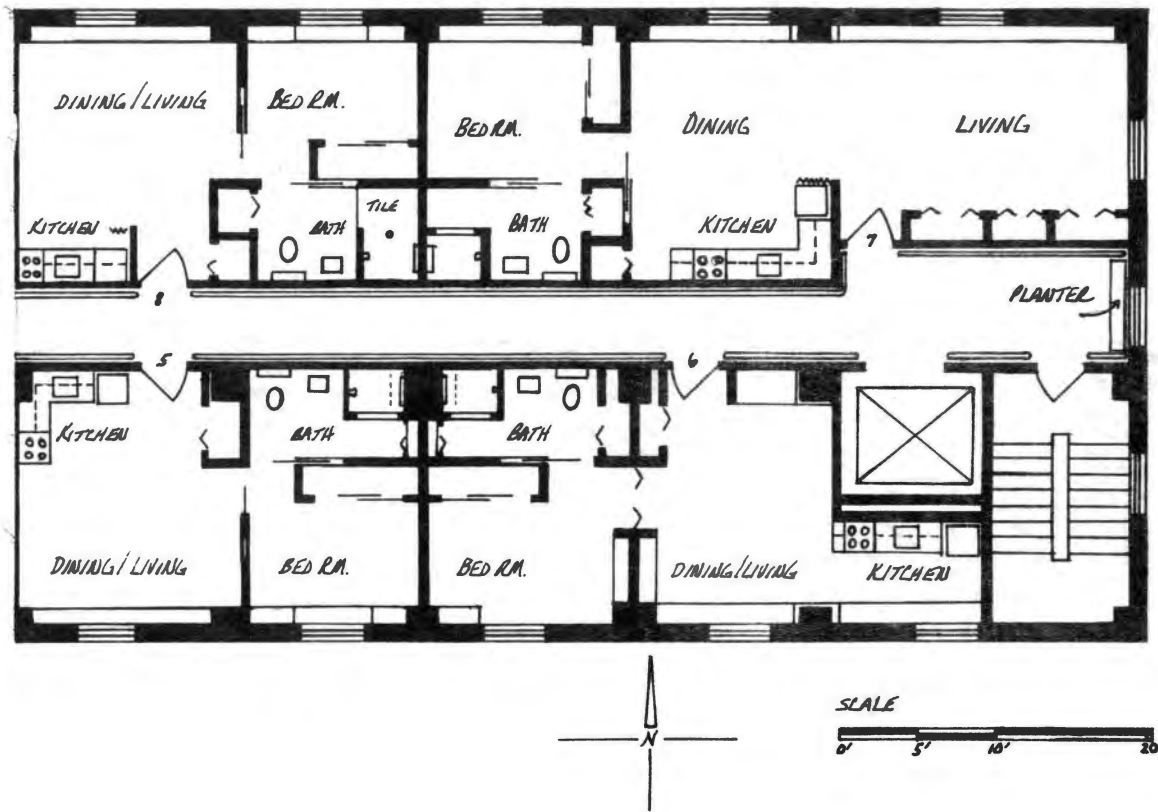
Floorplan Showing Suggested Conversion for Typical Wing of Stout Hall (Second and Third Floor)
